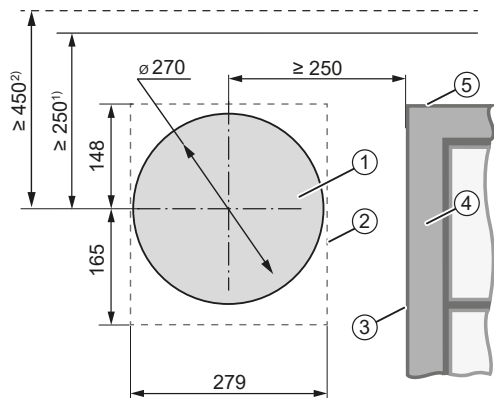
Dimensional drawing of the iV-Office wall opening (interior view)
